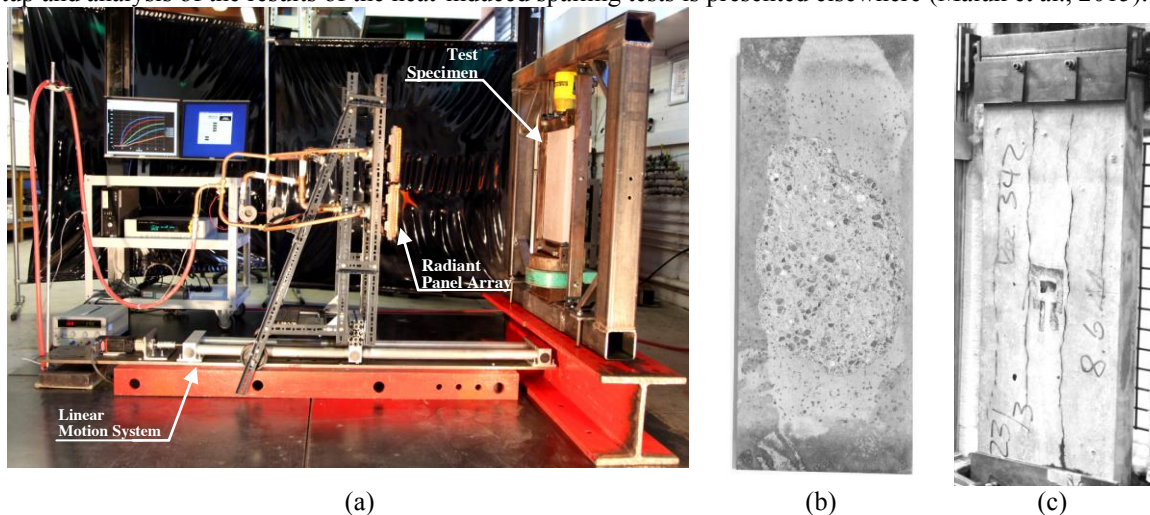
Photograph of (a) H-TRIS during testing of medium-scale concrete slabs, (b) a typical specimen after spalling, and (c) a typical specimen after the formation of longitudinal splitting cracks.
